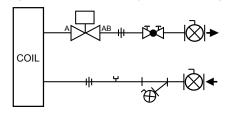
Deluxe 3-Way Valve Package (Auto CS)
